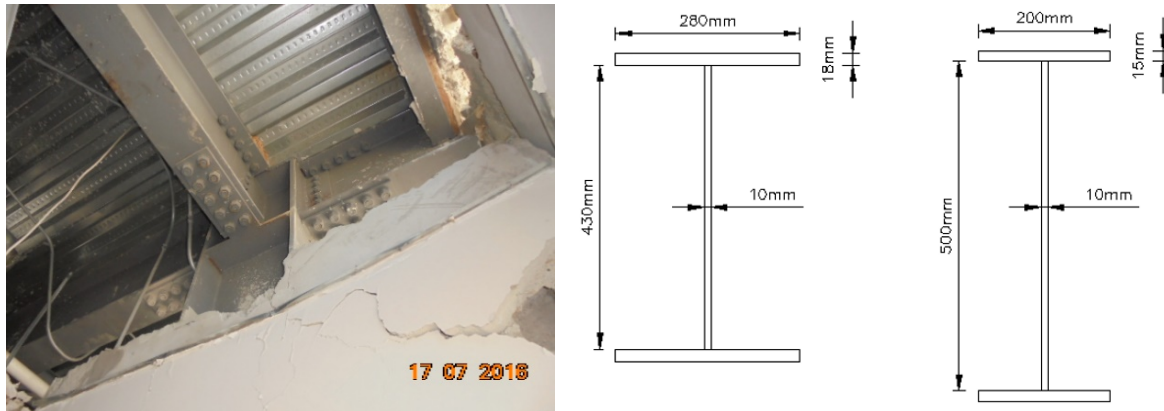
BFP connection and profiles used in columns and beams. Source: (Aguar et al., 2016)
